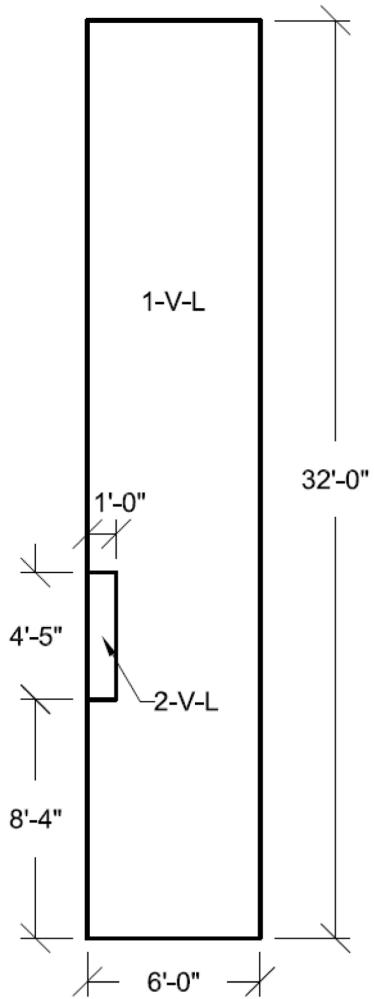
H.6-149 DGFOSV Roof 2 Looking Down Horizontal Reinforcement Zones Far Side Face
